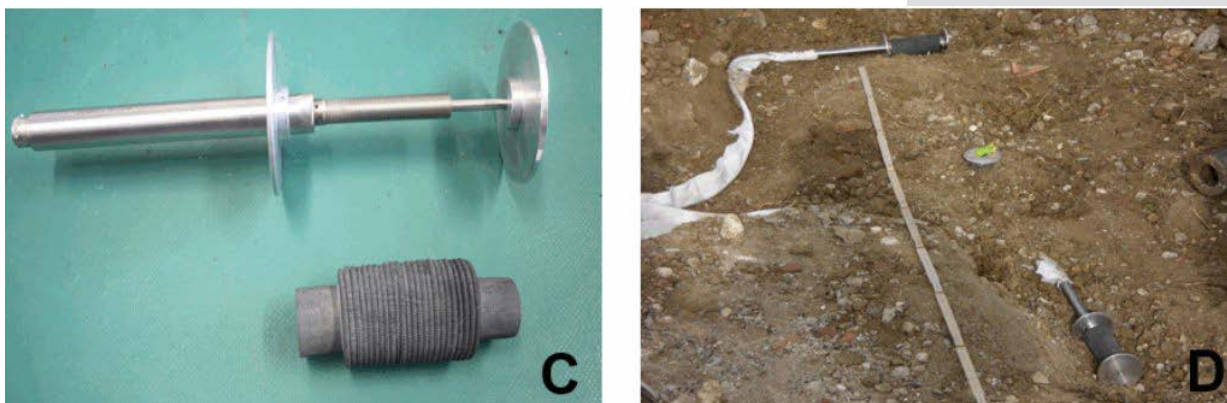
LVDT with plates and protective sleeve (C) and their positioning (D).
